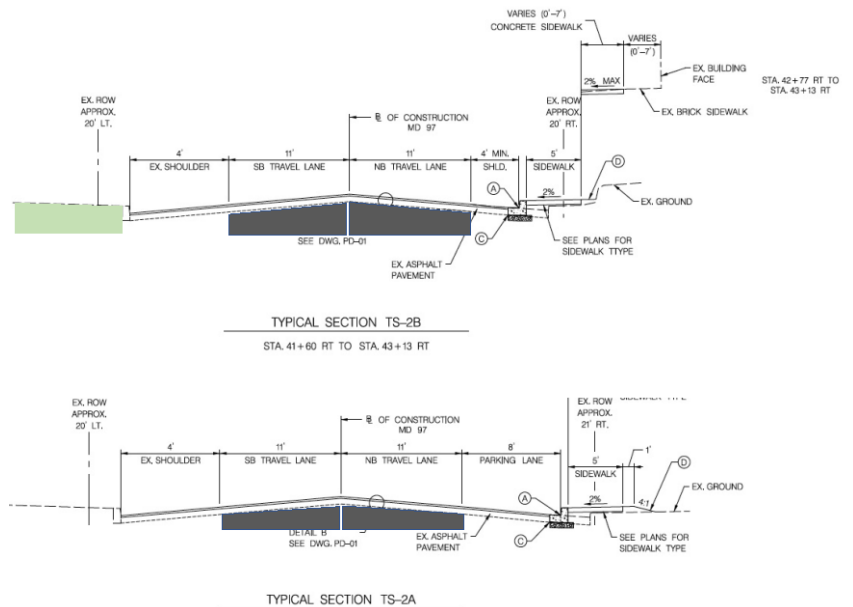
MDOT SHA sidewalk concept typical sections (May 2018)
